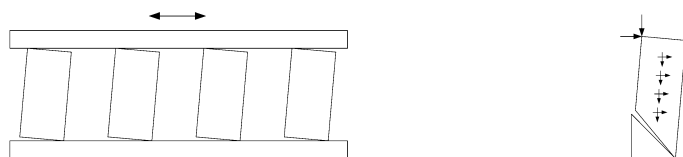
Generic configuration under alternate horizontal actions: masonry wall (left) and cracked wall pier (right).
